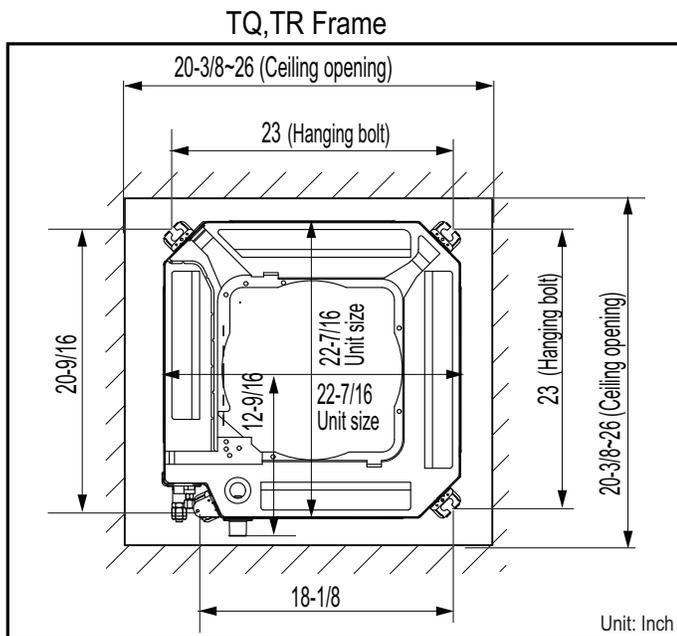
Ceiling Opening / Hanging Bolt Locations for Four-Way Ceiling Cassette Indoor Units.
